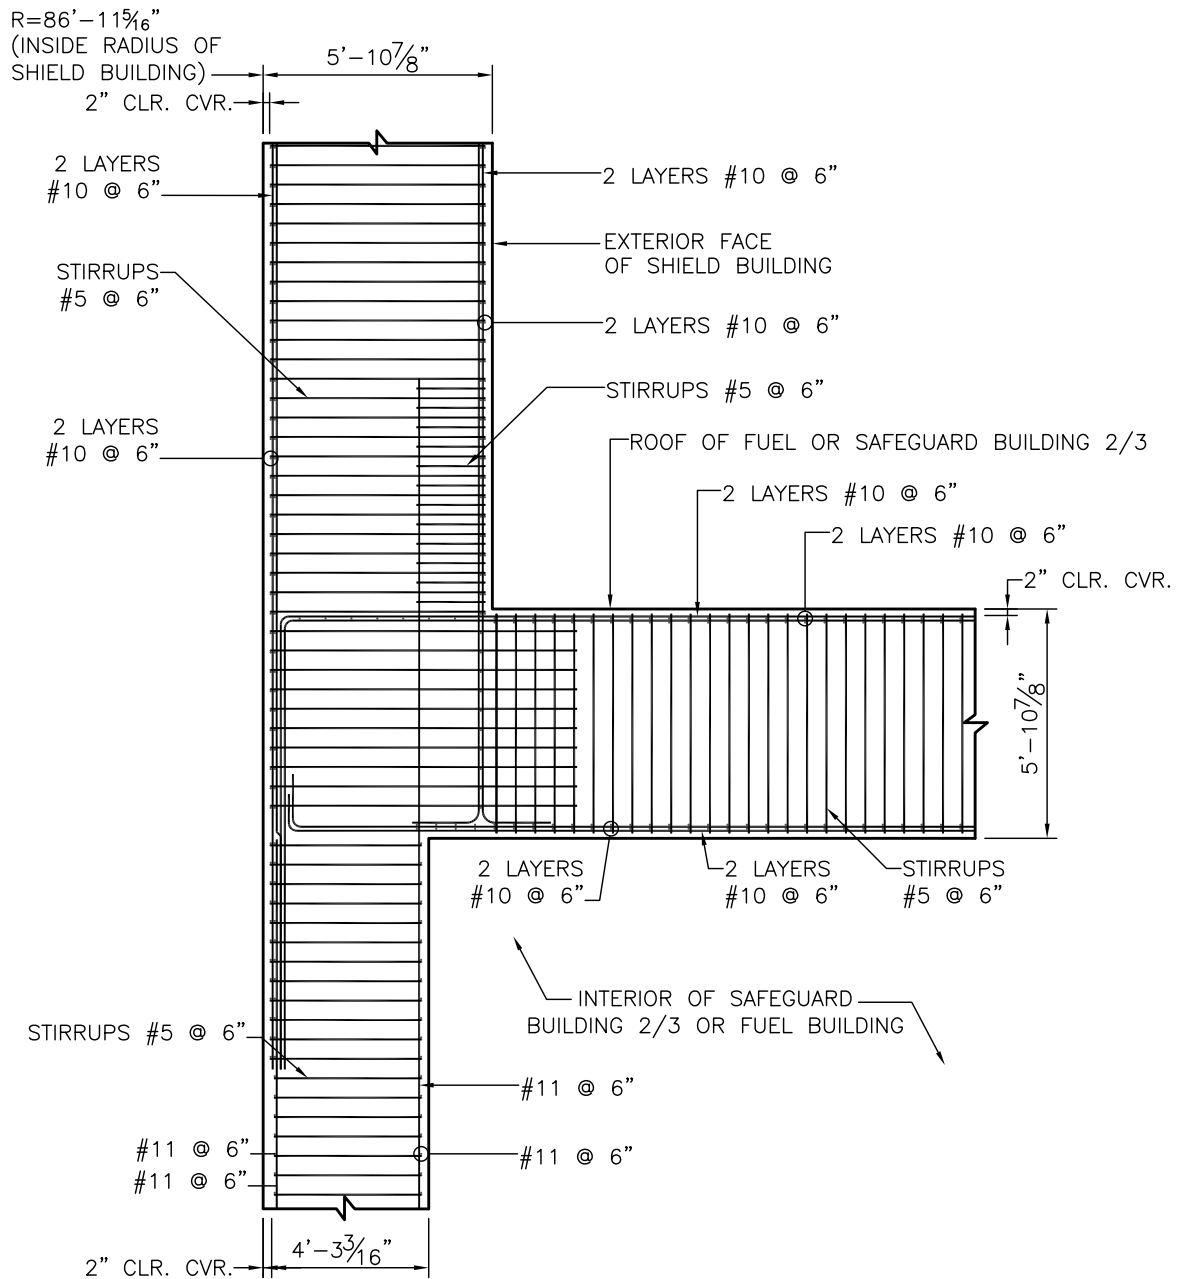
E.1-63—RSB Wall to Roof Connection - Typical Reinforcement
